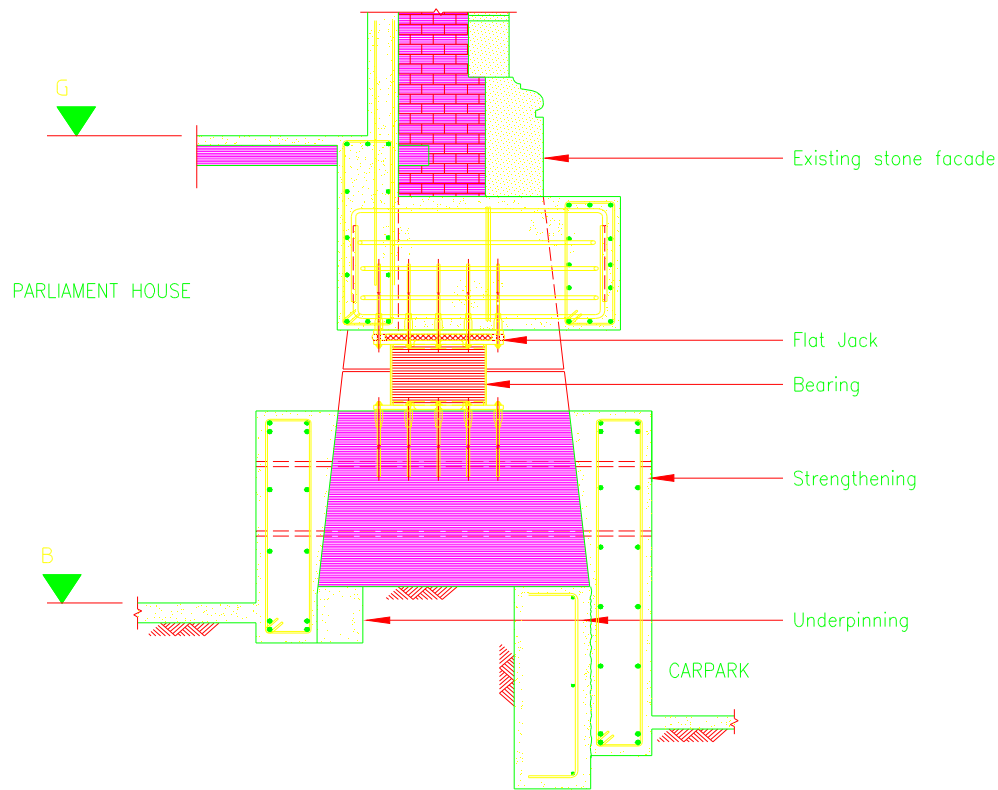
Bearing Installation and Strengthening of Basement Walls
